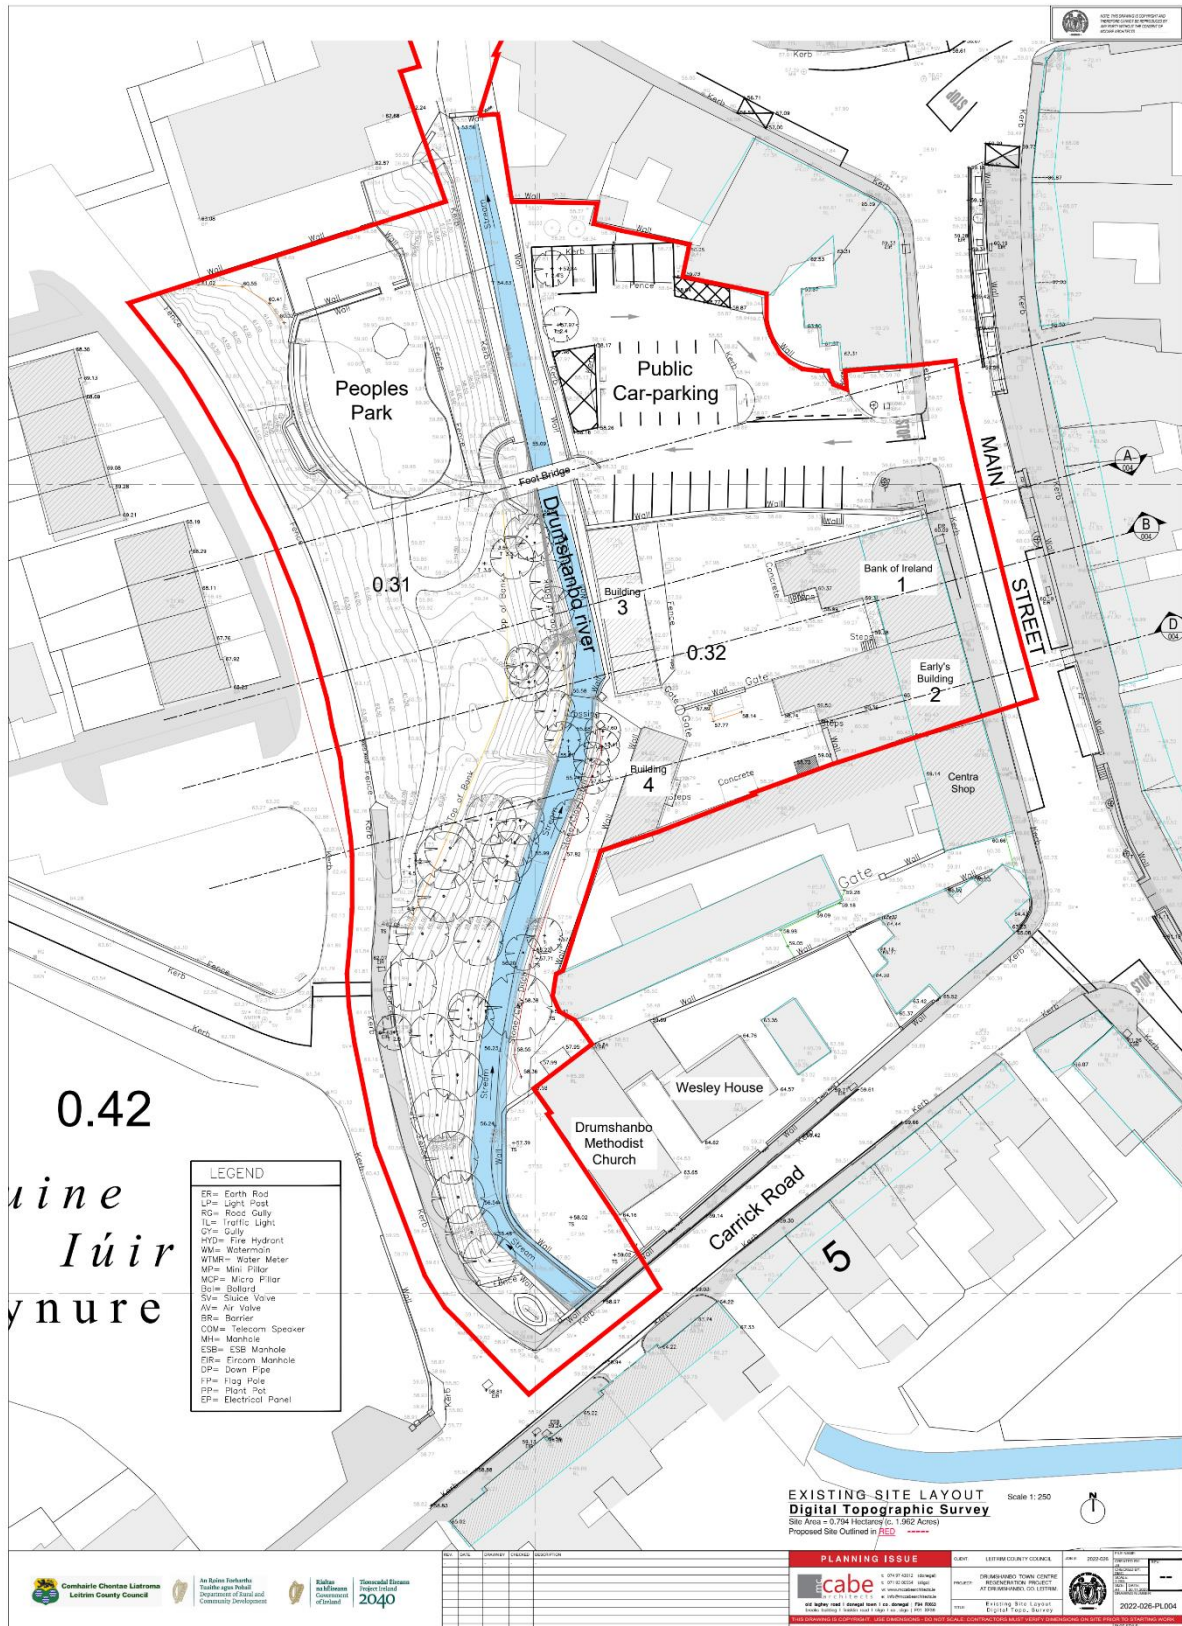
Existing Site Layout Plan (Source: McCabe Architects)
